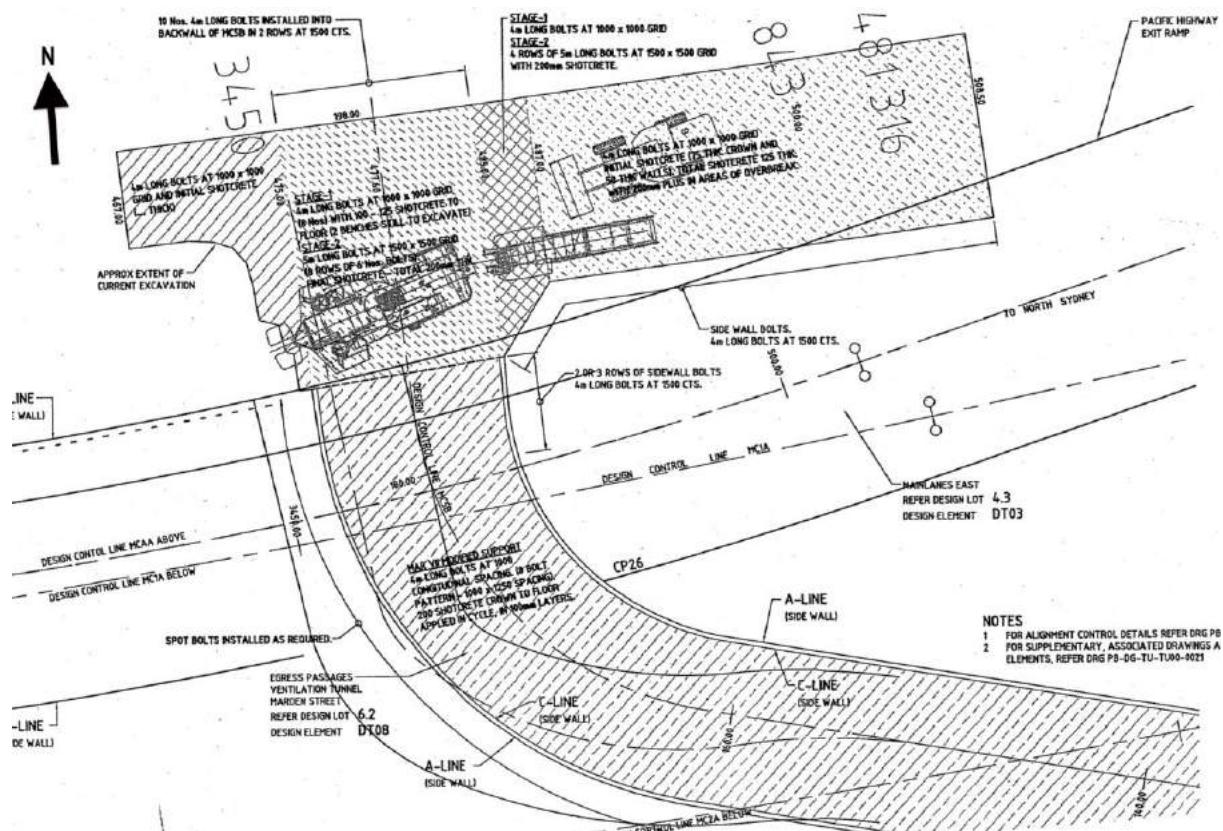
The general layout of the intersection of the Marden St ventilation tunnel (MC5B) and the Pacific Highway exit ramp (MCAA)
